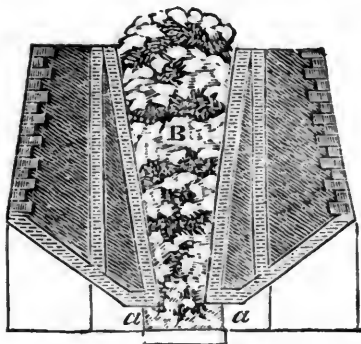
is a ground plan, fig. 2 a section B. Body of the kiln.
